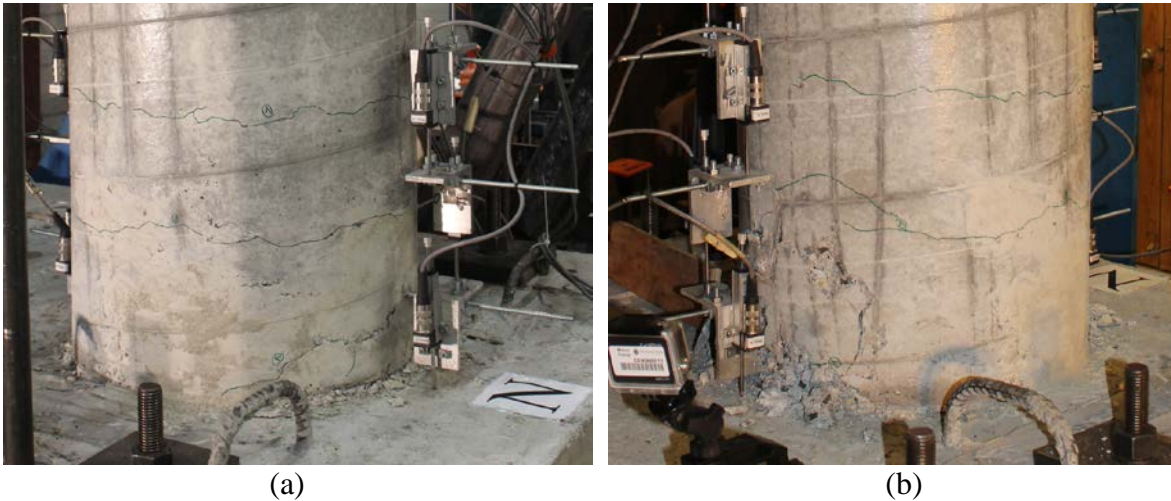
Damage in Column 1. (a) Horizontal cracks and spalling of concrete for 1.00 Capitola X, (b) Crushing of concrete for 1.48 Capitola X
